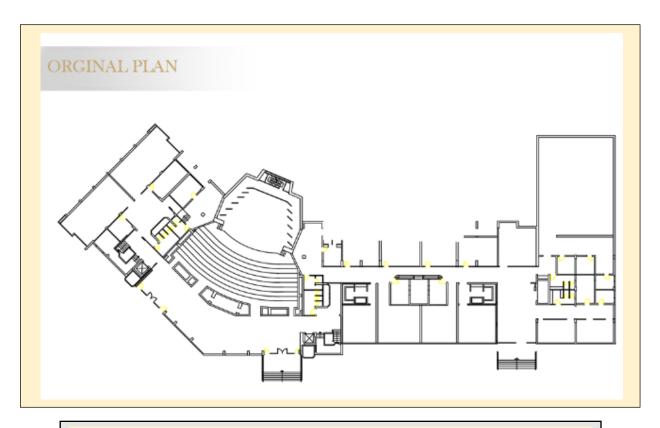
illustrates the original floor plan of the Academy of Arts in Giza, Egypt.
